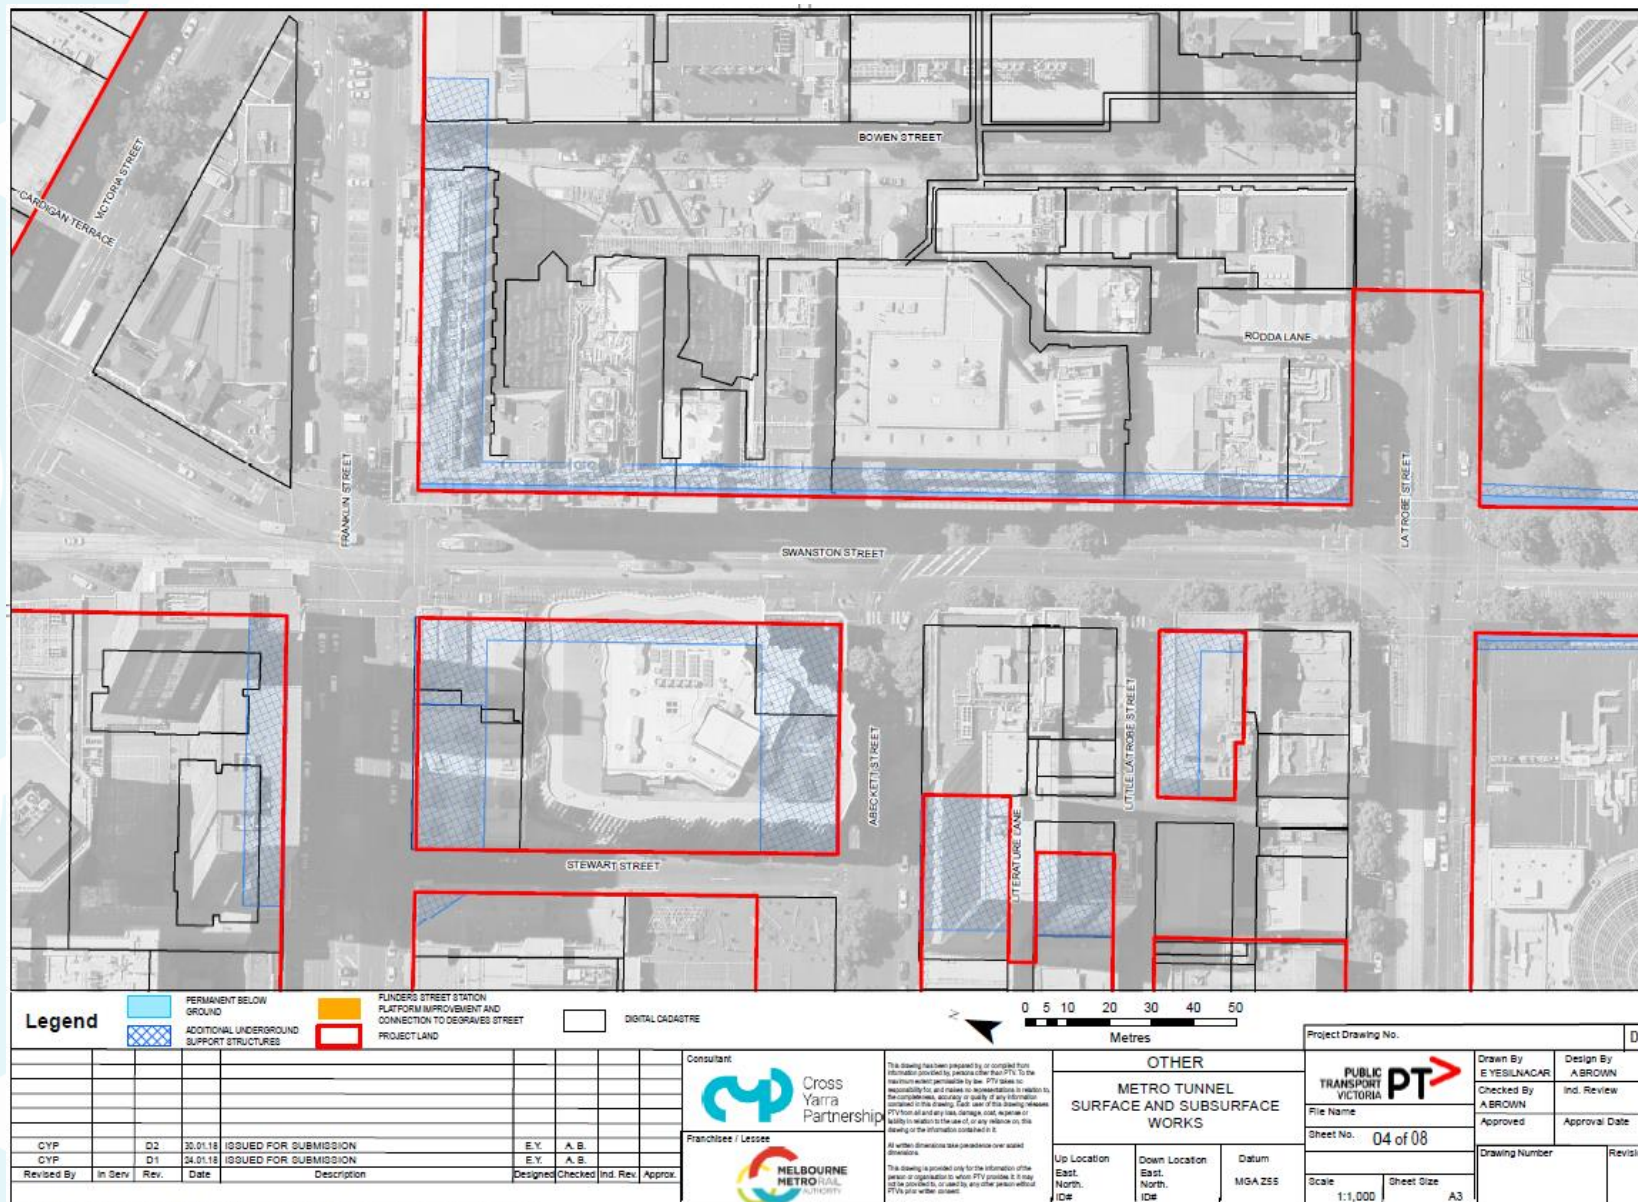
ADDITIONAL PROJECT LAND REQUIRED FOR UNDERGROUND SUPPORT STRUCTURES AND PERMANENT BELOW GROUND AT CBD NORTH STATION
